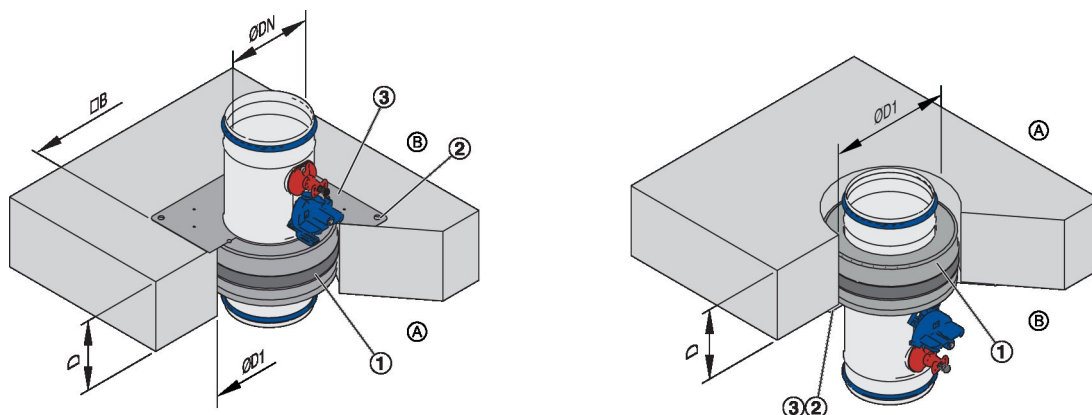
Dry mortarless installation into solid ceiling slab, suspended or upright
